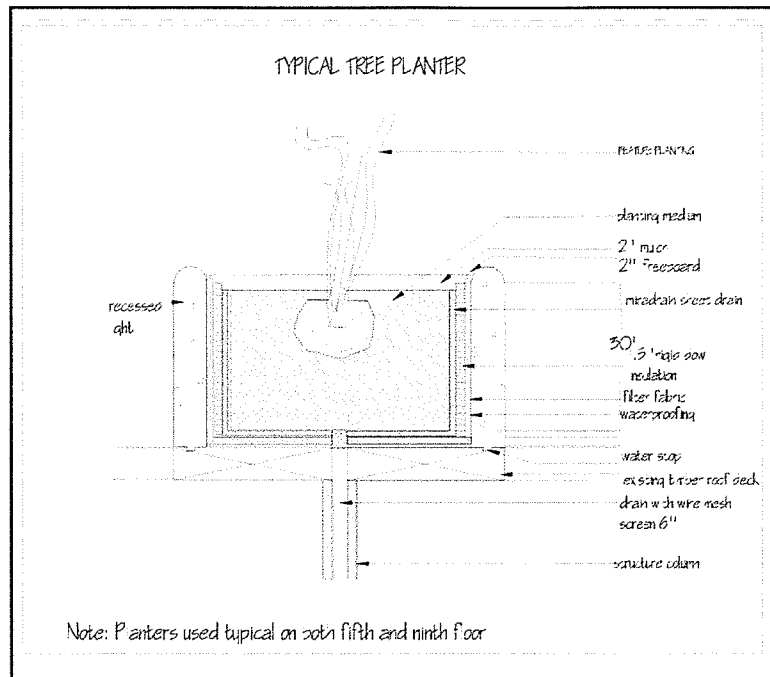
A Typical Tree Planter Fifth and Ninth Floors
